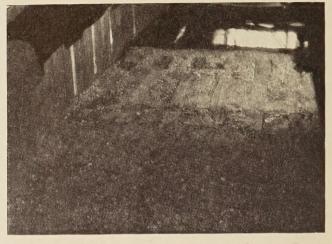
SINGLE-TRACK EMBANKMENT WITHOUT RAILS
